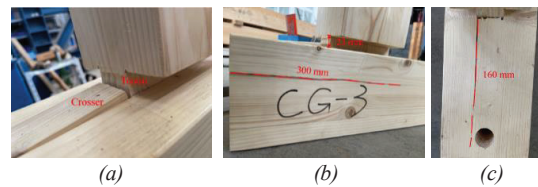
Failure modes of CG group: (a) push-out of crosser; (b) pull-out of tenon and splitting on the side of column and (c) crack on the lower end of mortise of column.
